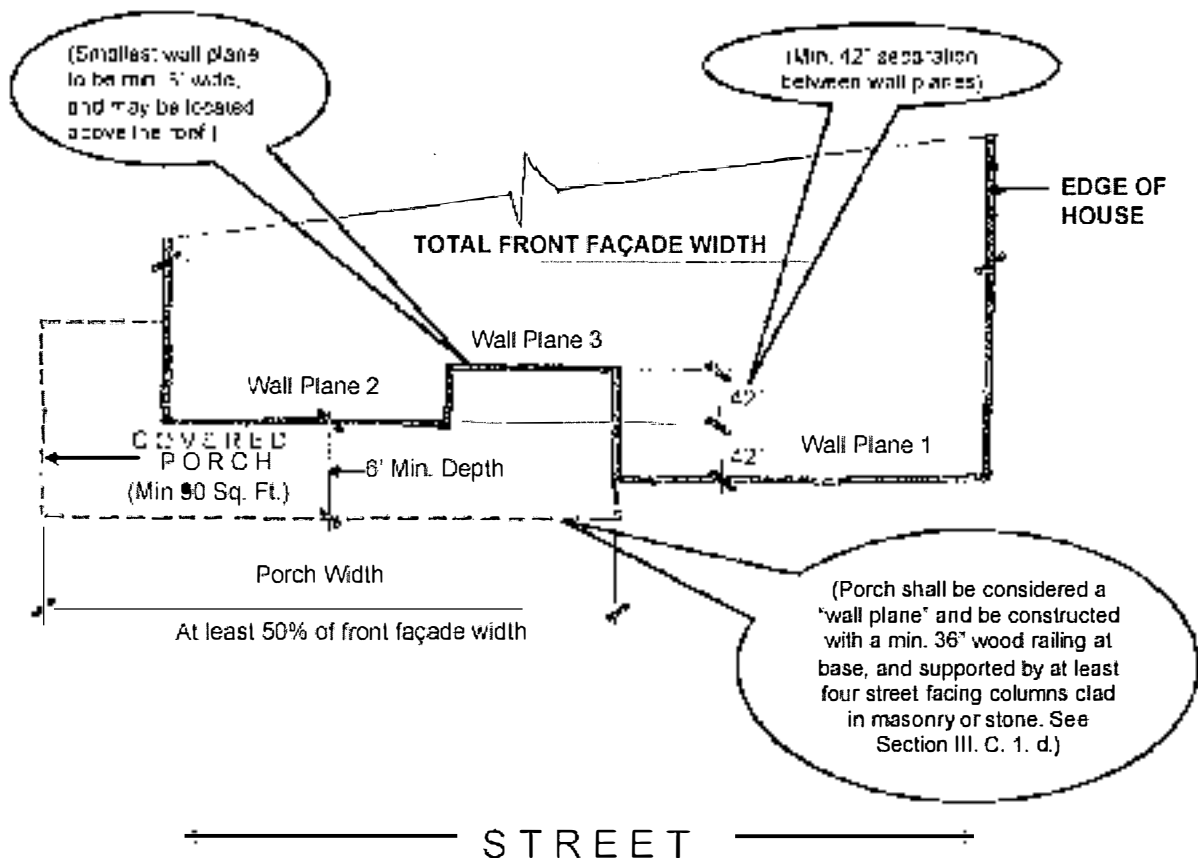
Hypothetical façade plan for residences styled with a historic architectural theme.
